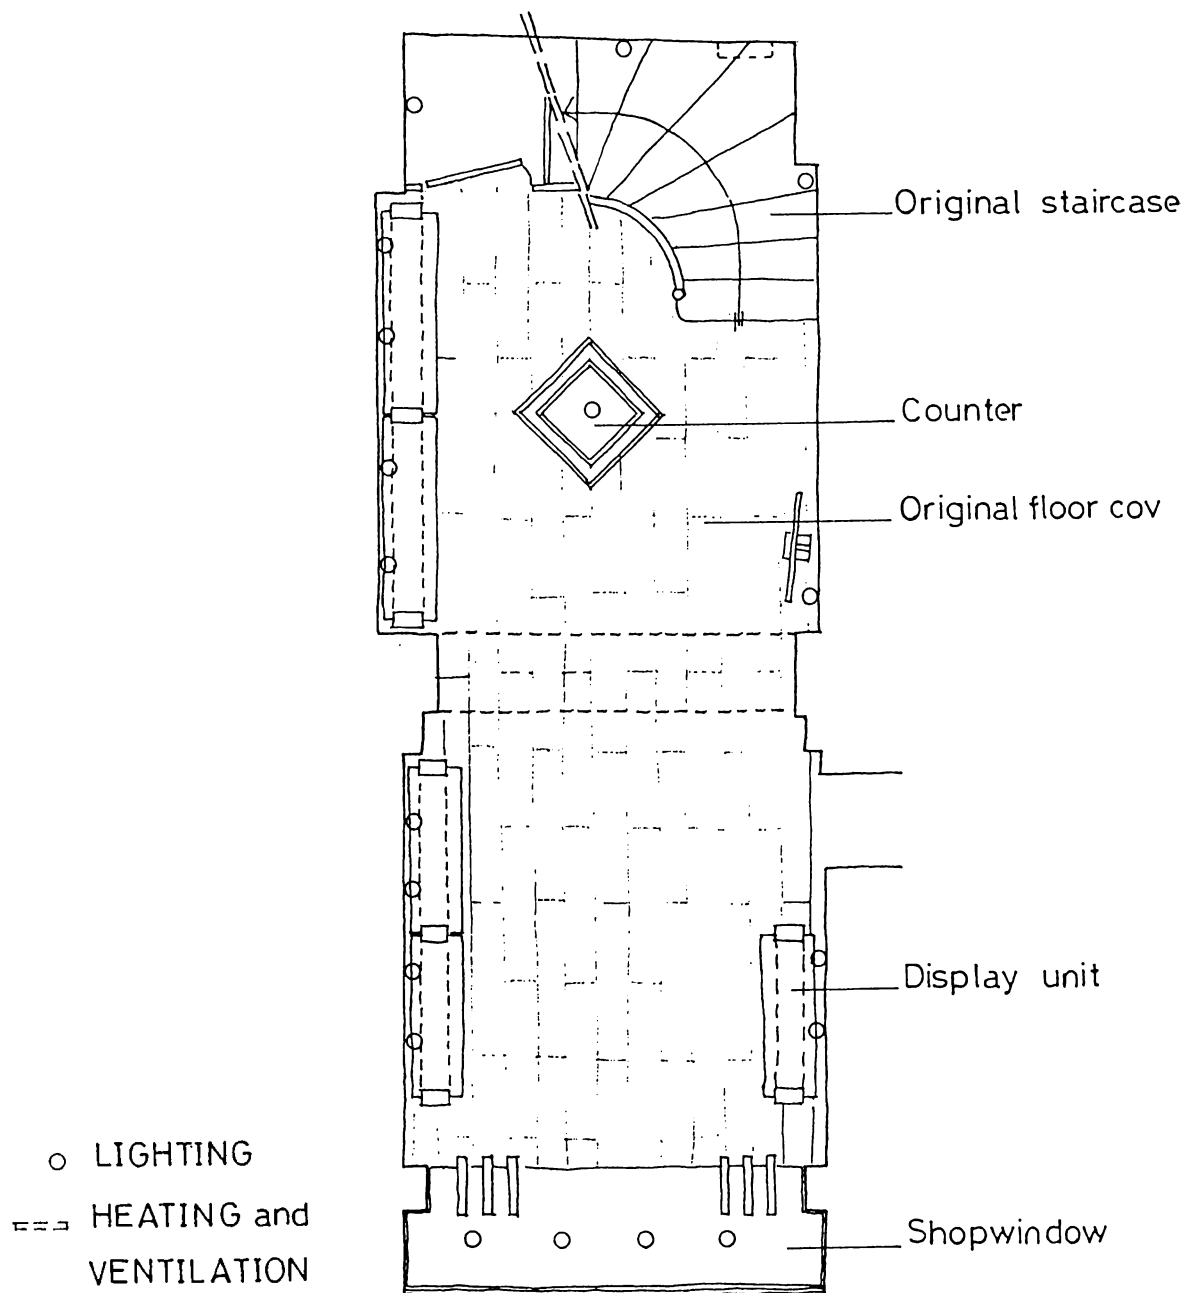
Mezzanine floor plan of the *sarraf* shop
